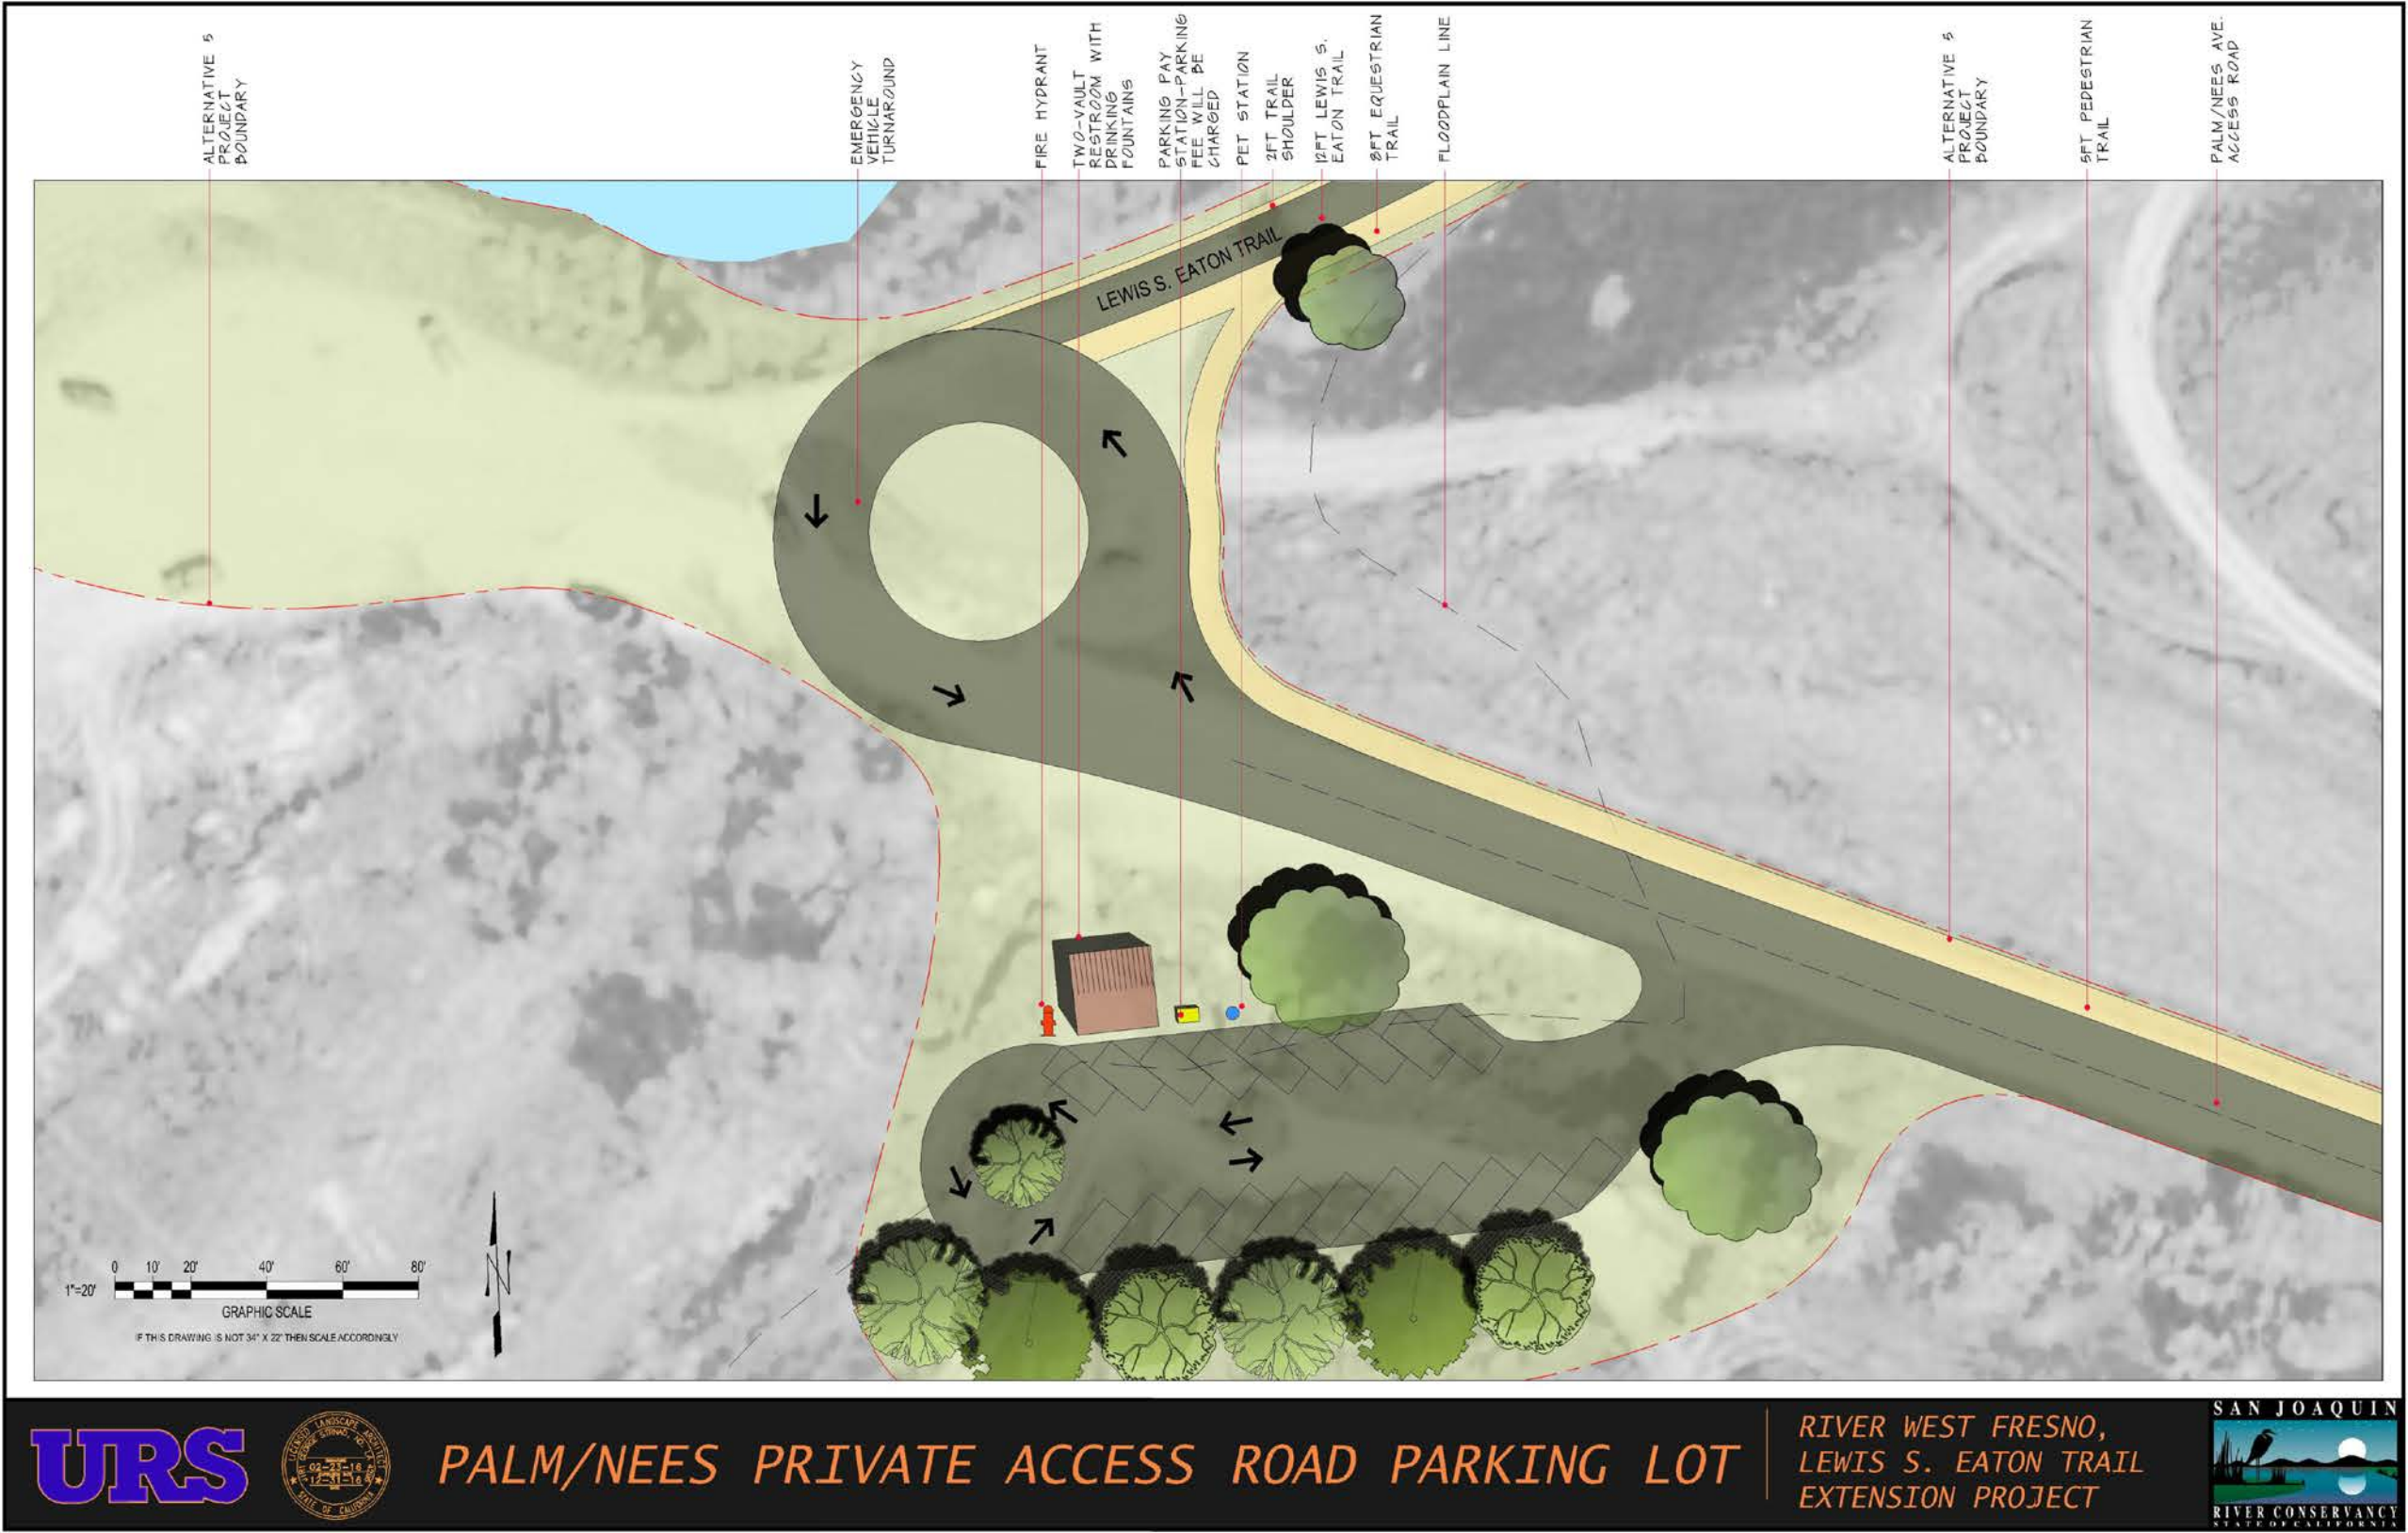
Palm/Nees Private Access Road Parking Lot
